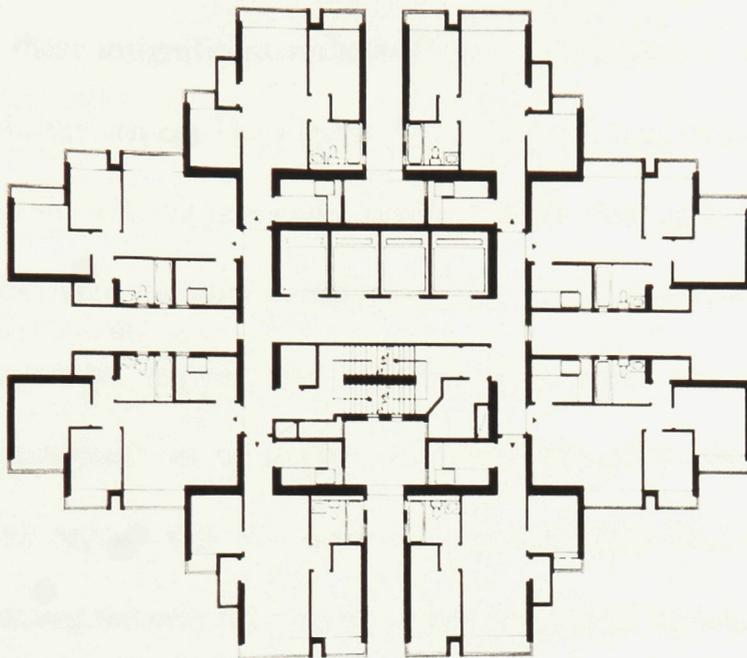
A typical residential floor plan with 8 households' dwelling floor layout.
